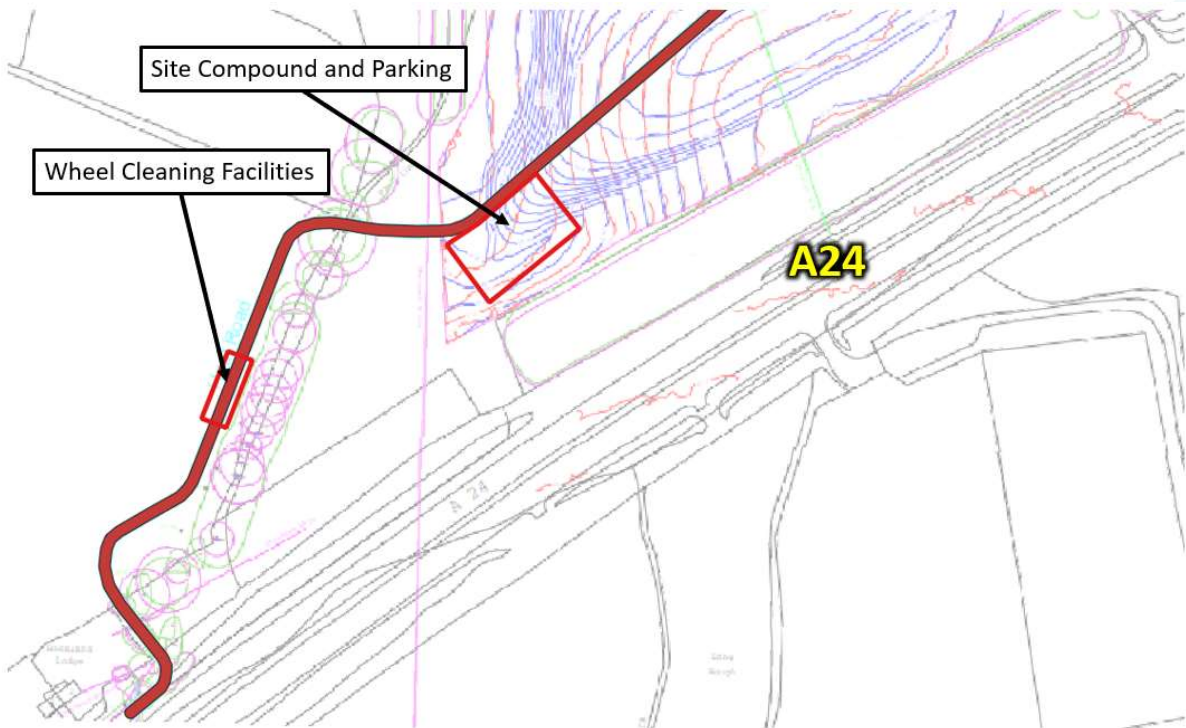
Site Compound, Parking and Wheel Cleaning Facilities Area
